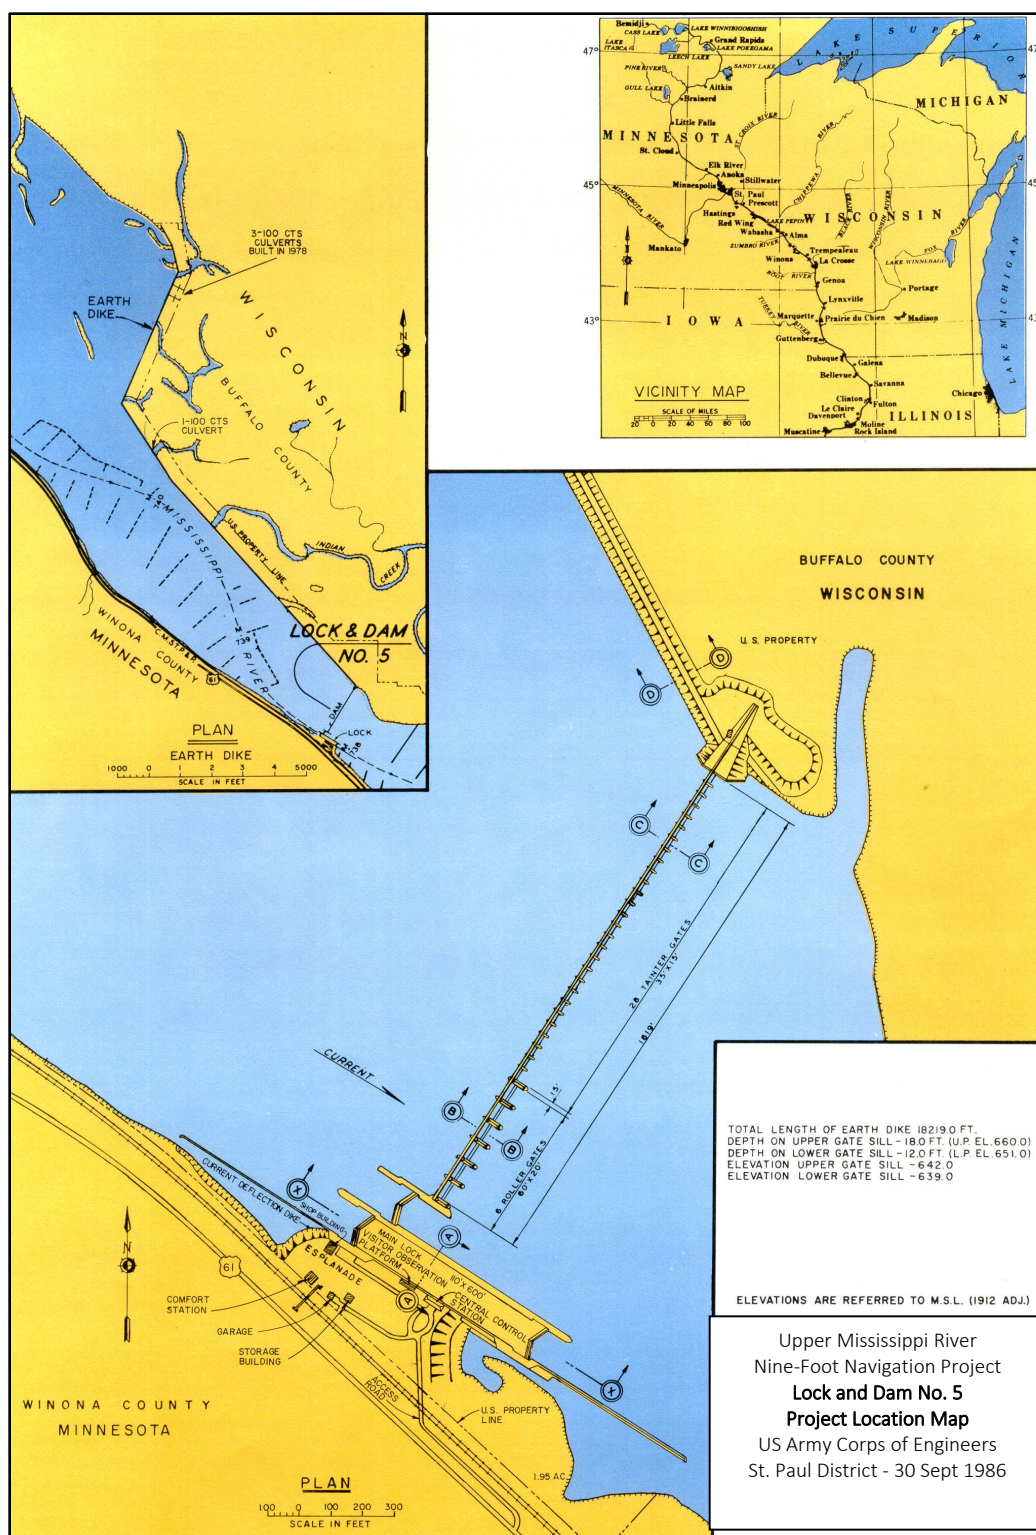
Lock and Dam No. 05 Project Plan. Plan shows the length of the dike, depth of sills and elevations of sills as planned in 1912 (USACE 2002b).
